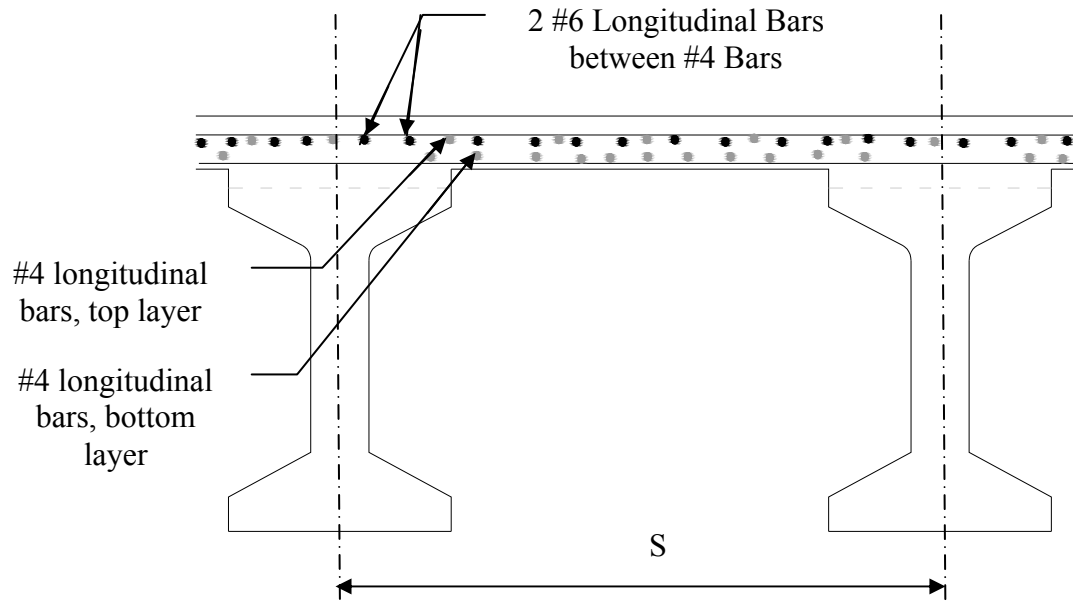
Section view at construction joint of current design detail (modified from GDOT SR 46 Over Oconee R. plan)
